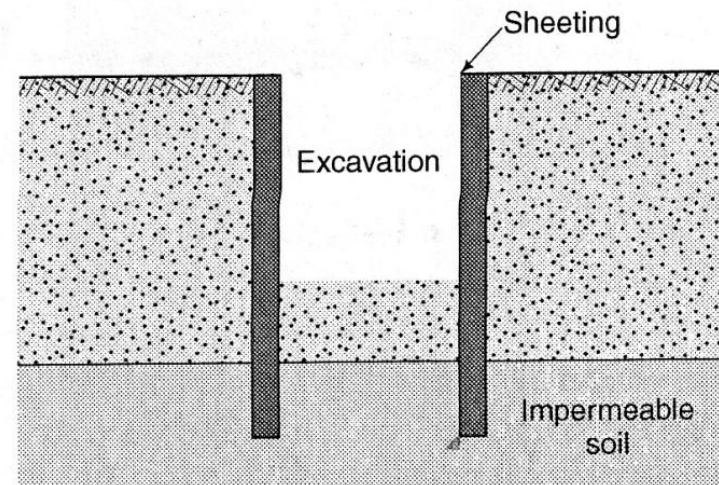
Sheet piles placed into an impermeable layer for dewatering a foundation.
